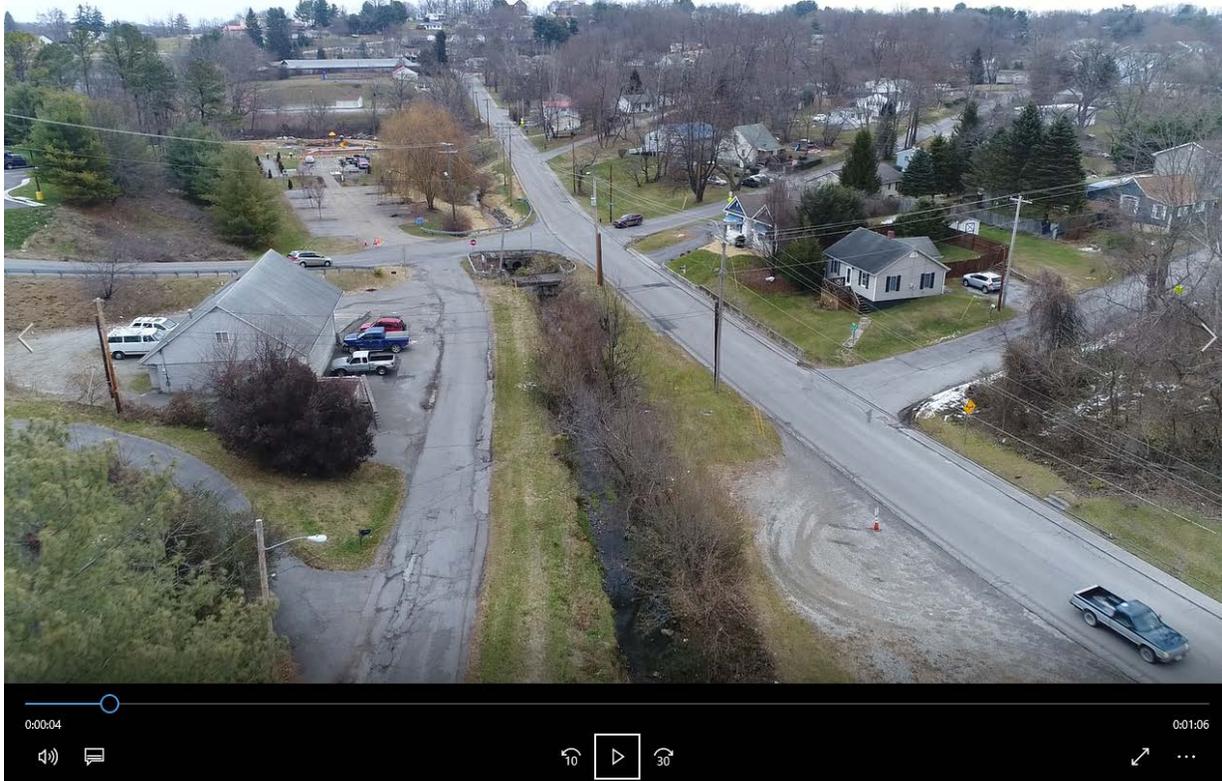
Exhibit C – Aerial Imagery of Town Branch at Stone Street
